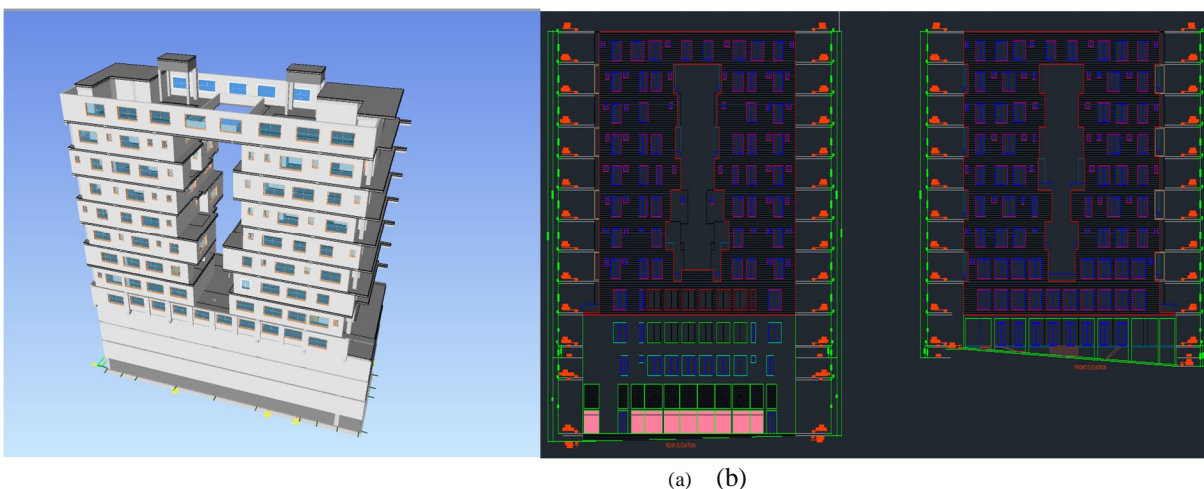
Visualization – (a) Revit 3D Model, (b) AutoCAD 2D Elevation
